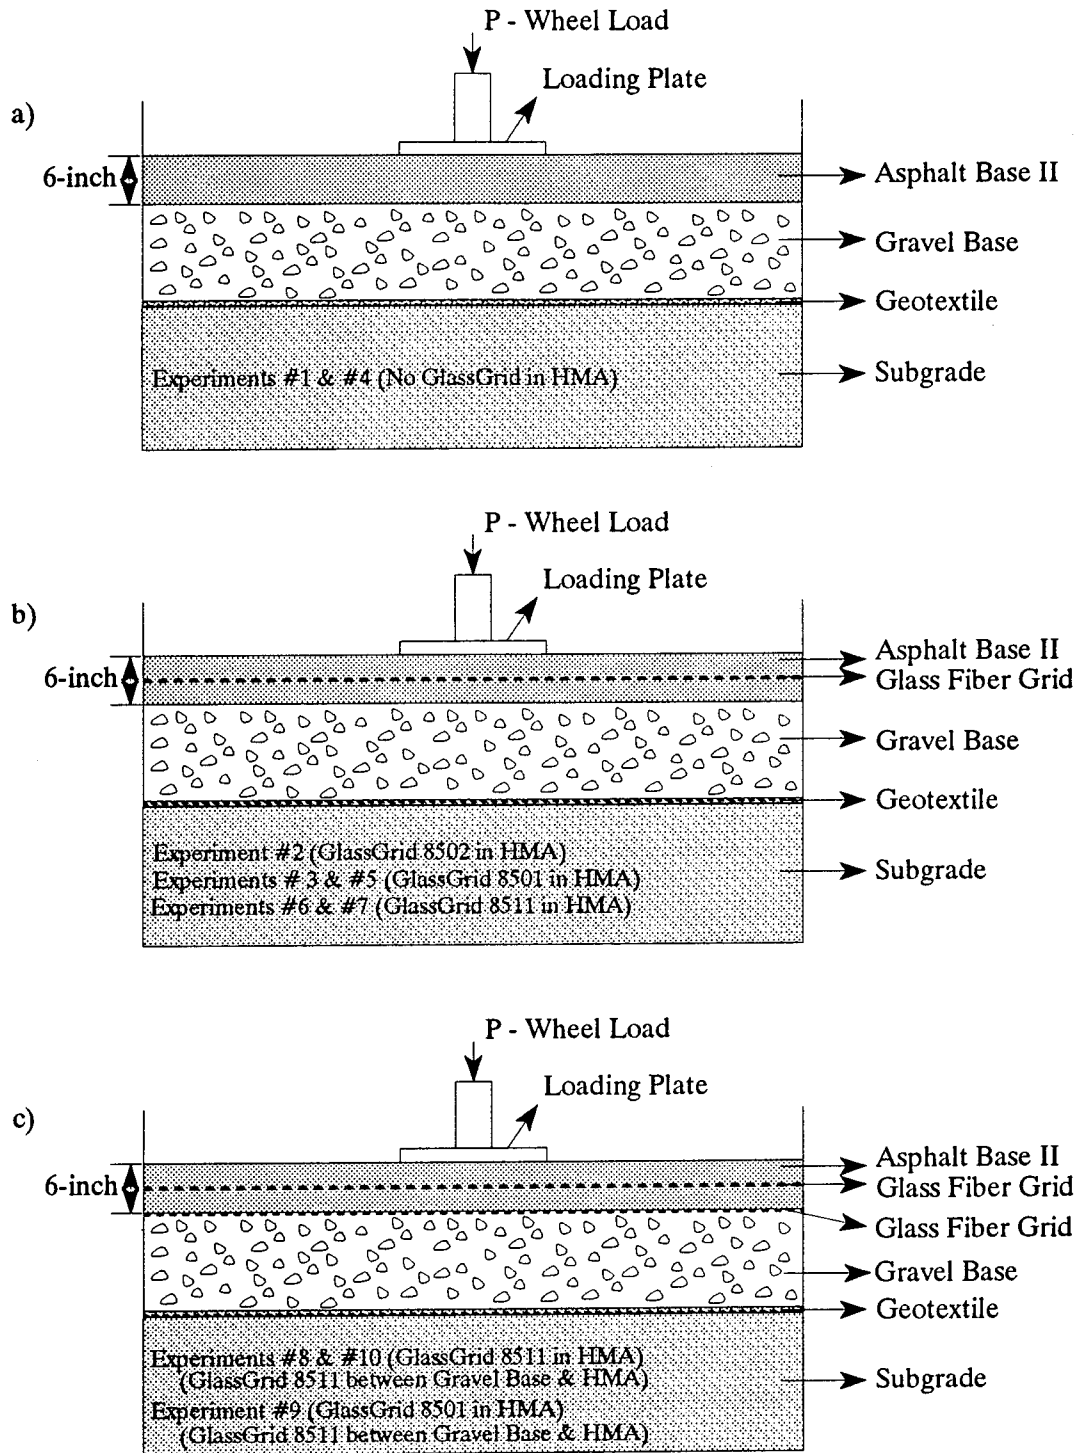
Experimental Outline for Pavement Section with a 6-Inch (152 mm) Thick Asphalt Layer
